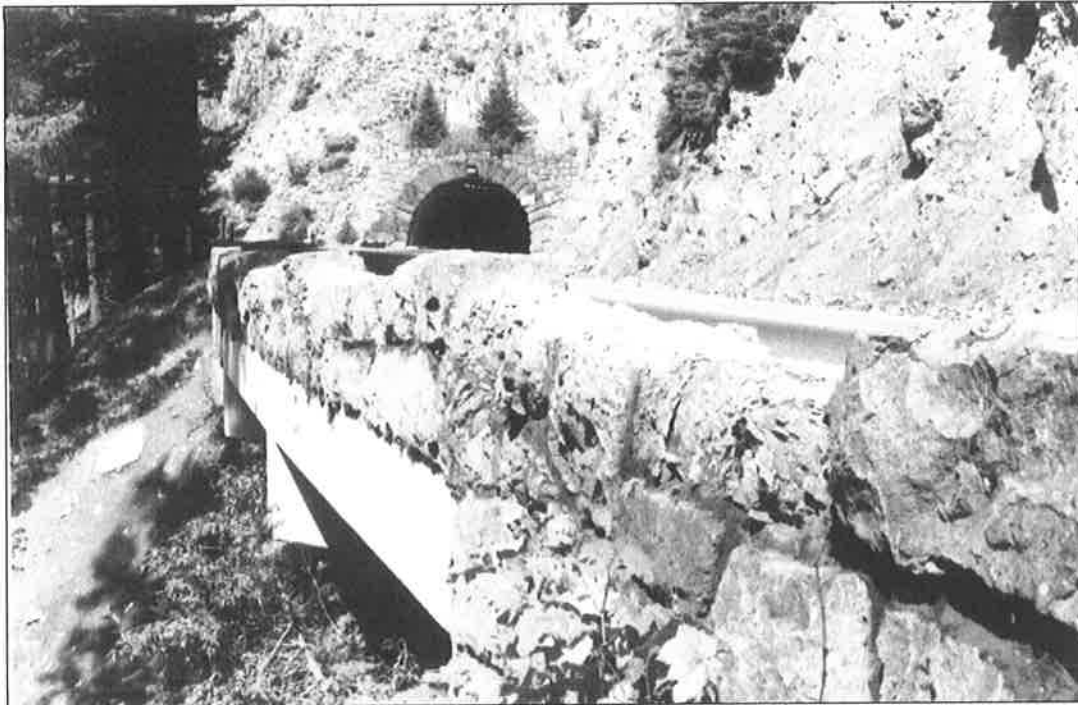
Masonry rock bridge rail parapet in 1981, which was already starting to “melt” and deteriorate.
